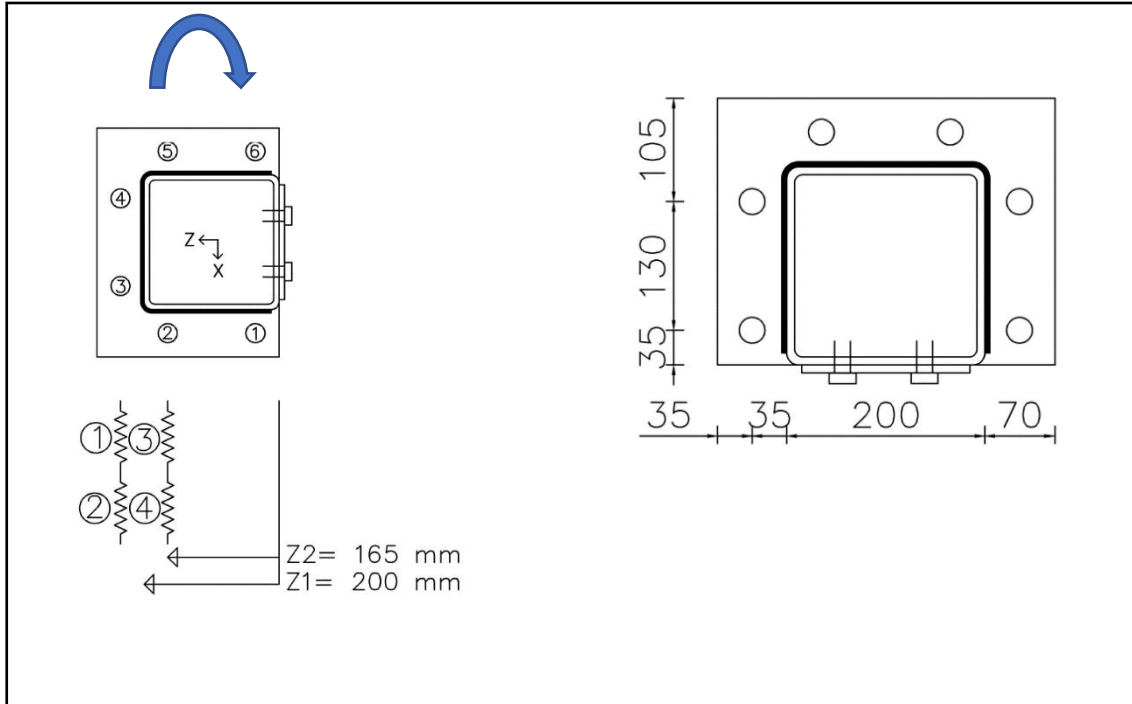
Plan and elevation of specimen IC-1 (case 1)
